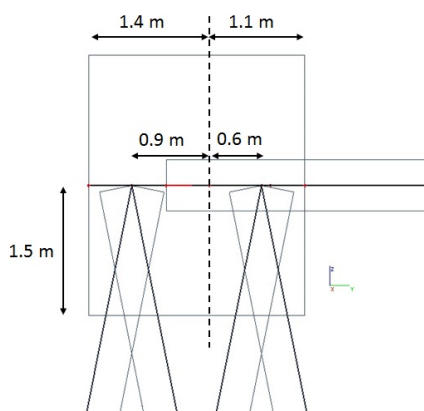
Connection between west abutment and axis 1 piles in SCIA
